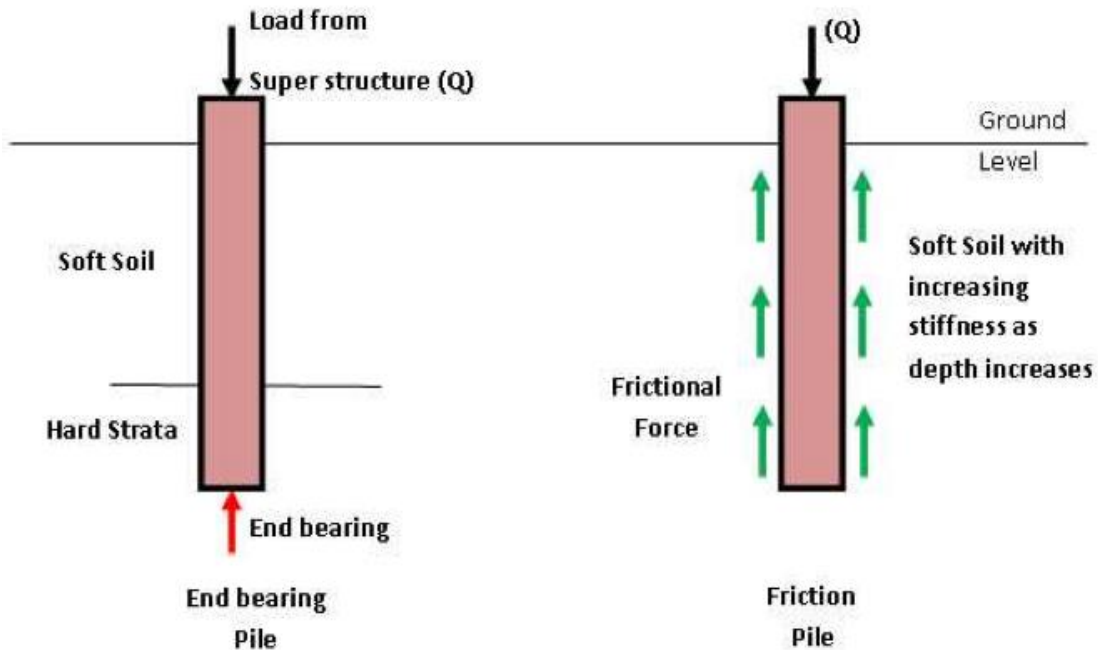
A typical pile foundation (Shakir et al., 2020)
